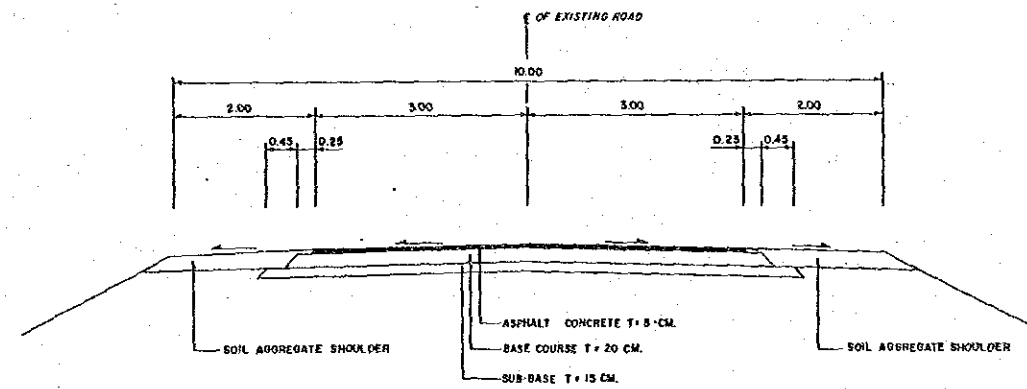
FIGURE TYPICAL PAVEMENT STRUCTURE FOR FLEXIBLE PAVEMENT IM-16
